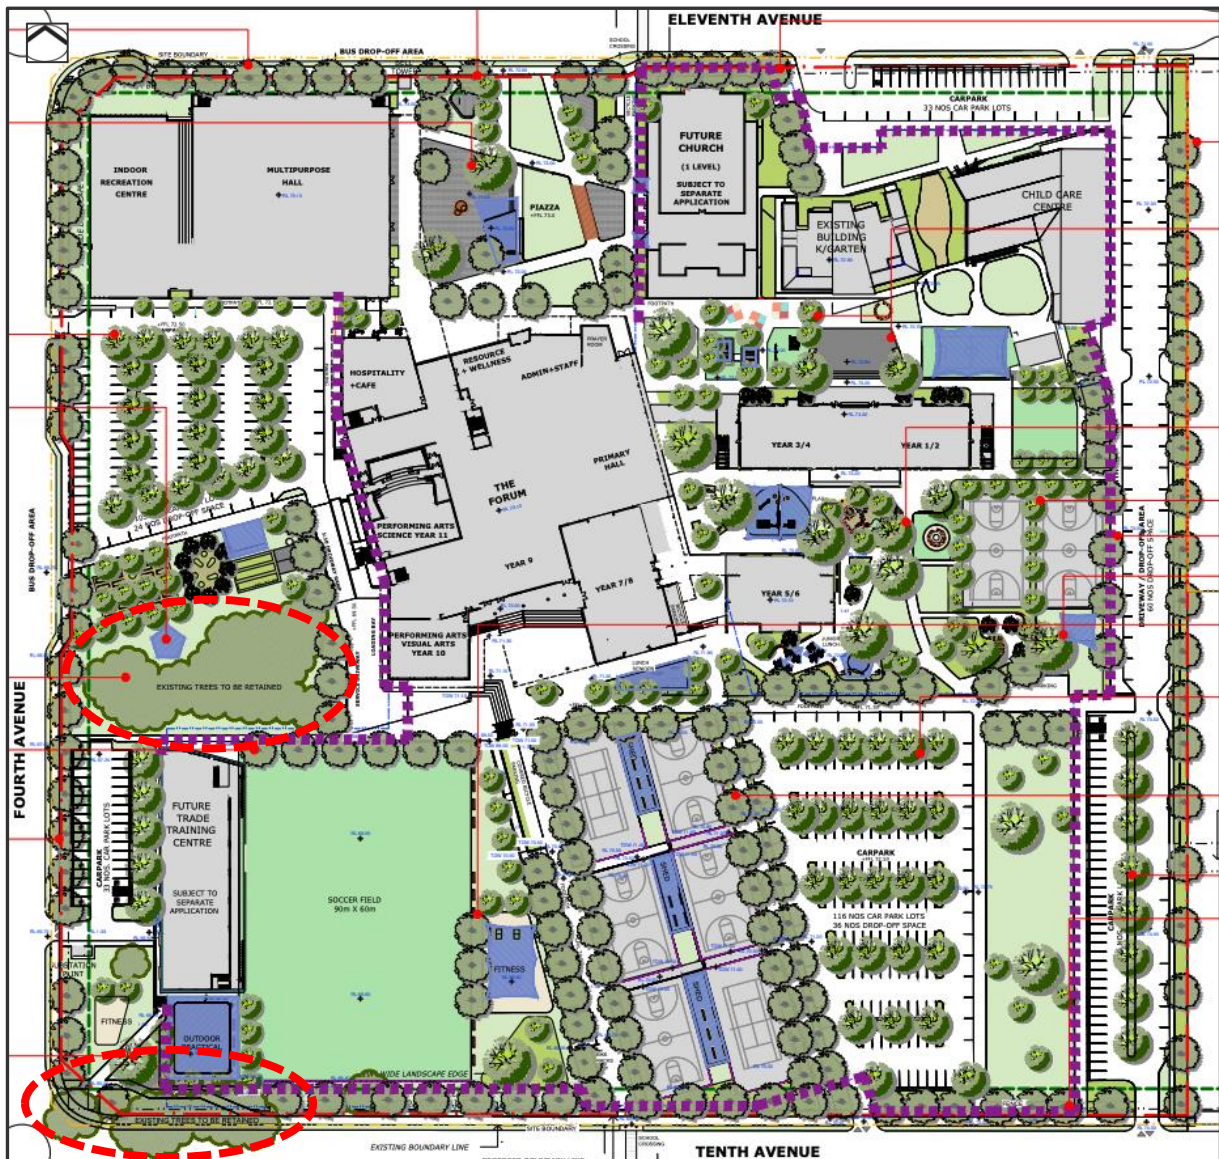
| Concept Landscape masterplan (Source: Applicant's SRTS)
